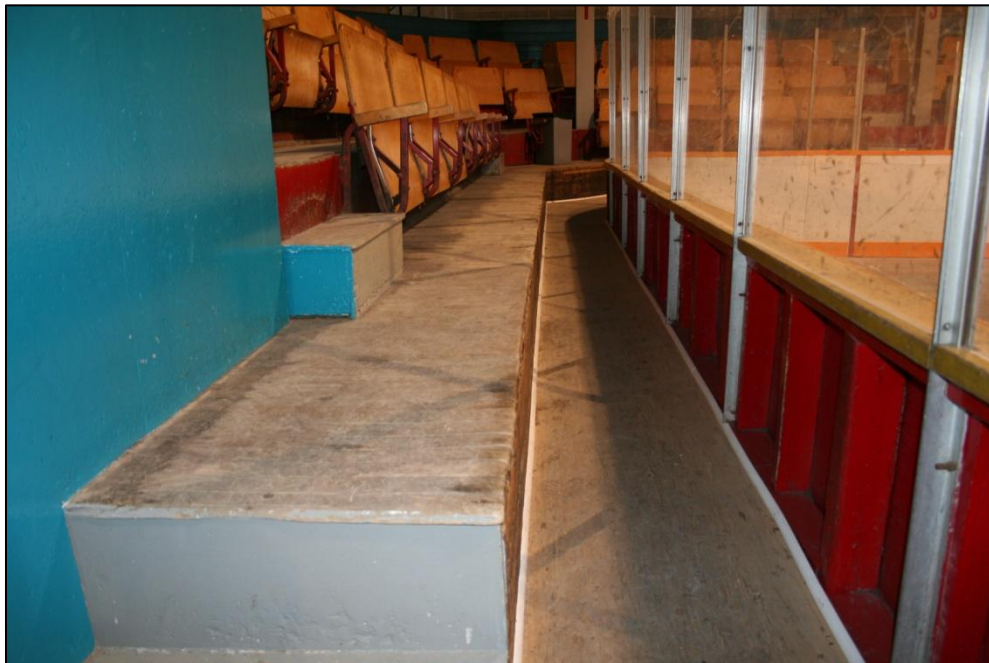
The original seating risers at the north end of the Memorial Arena. The wooden seats were later additions.
